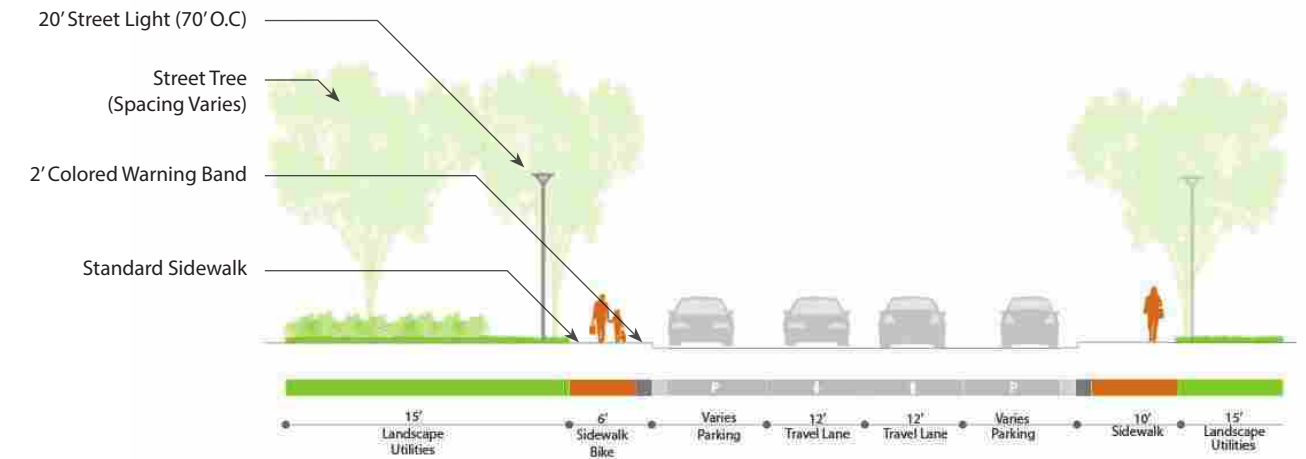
Proposed detail plan of (West) Ridgedale Drive (typical)
